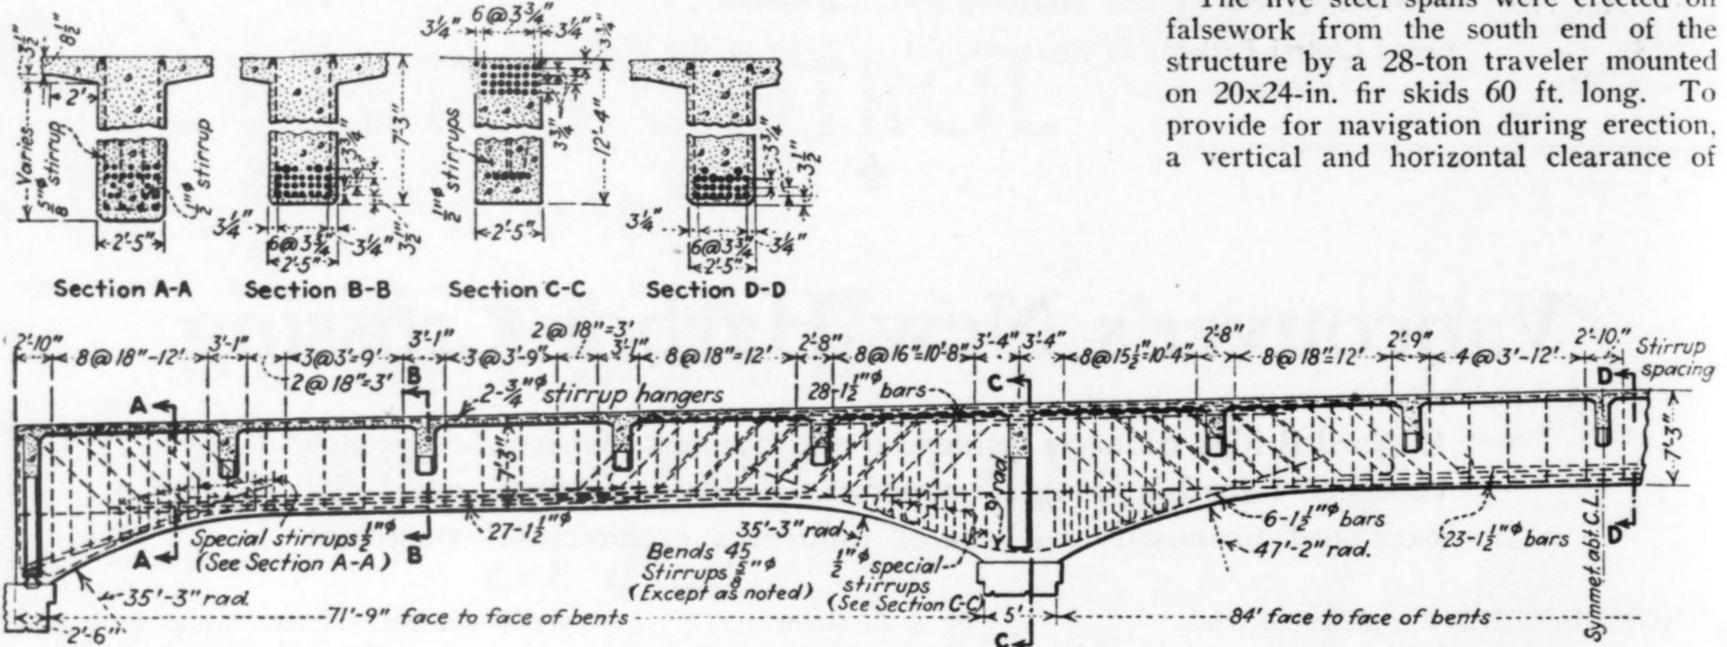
Details of concrete girders in the approach viaduct to the Burrard Bridge, Vancouver, B. C.
